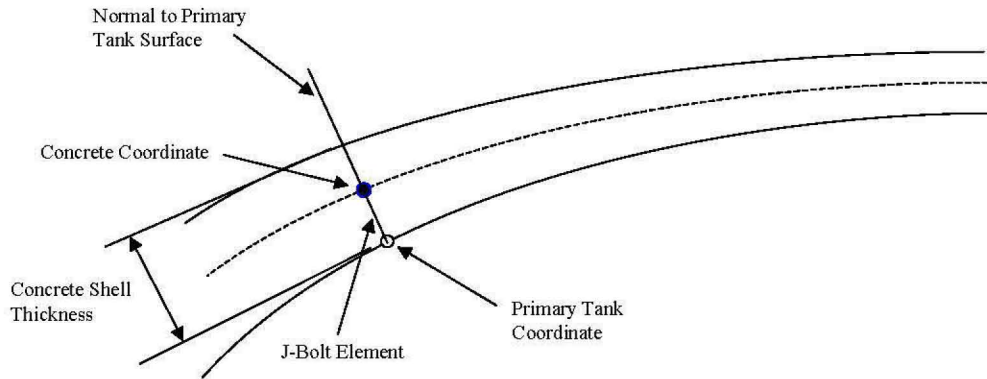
Concrete Tank Profile, Including Shell Thickness
